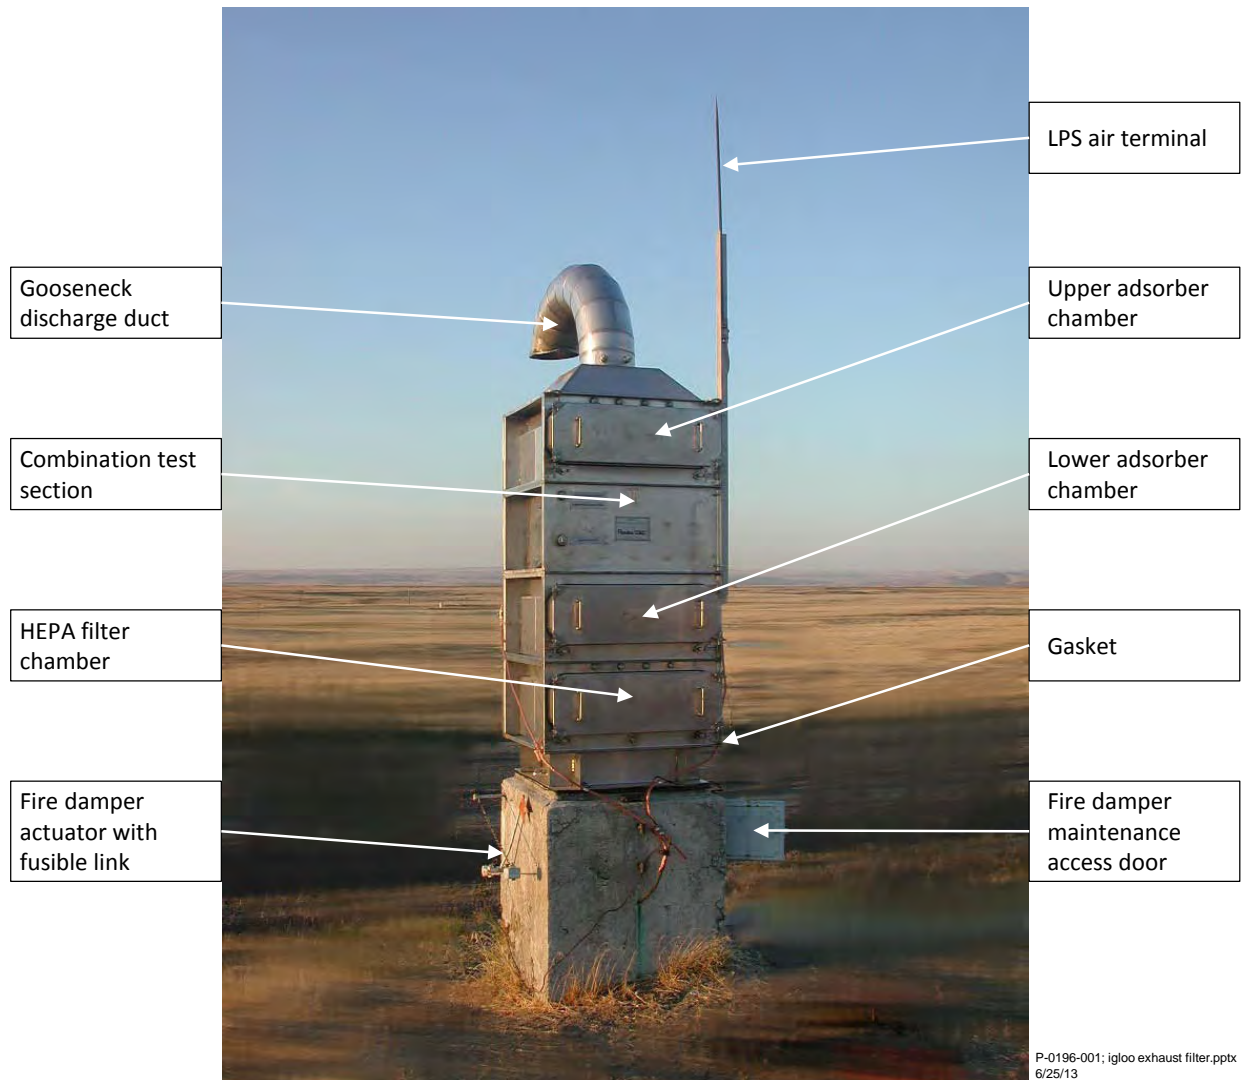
Igloo Exhaust Stack Door with Filter System Installed
